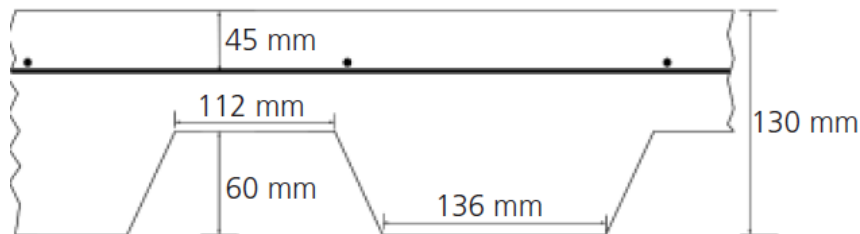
Concrete trapezoidal slab profile (Abu *et al.*, 2012)
